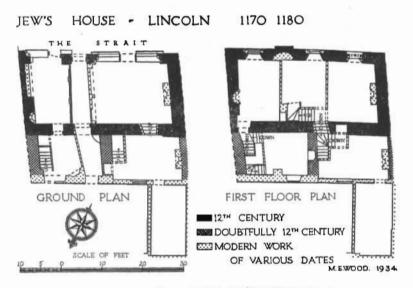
LINCOLN: PLAN OF ' JEW'S HOUSE'
